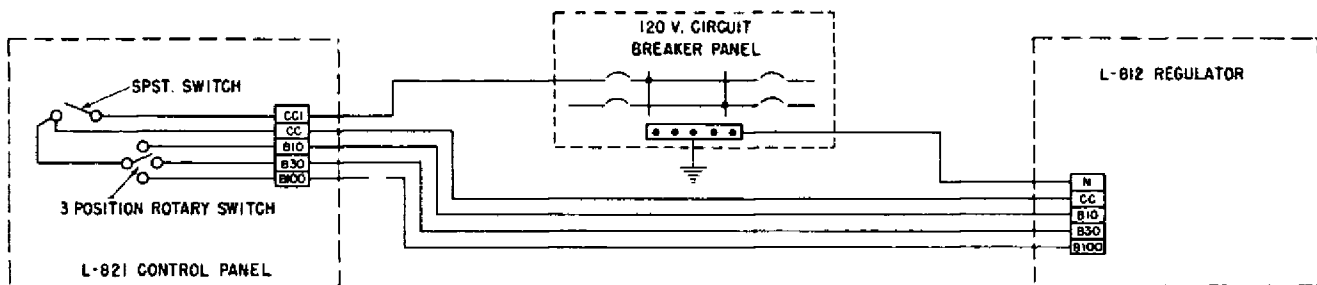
TYPICAL RUNWAY LIGHTING WIRING
